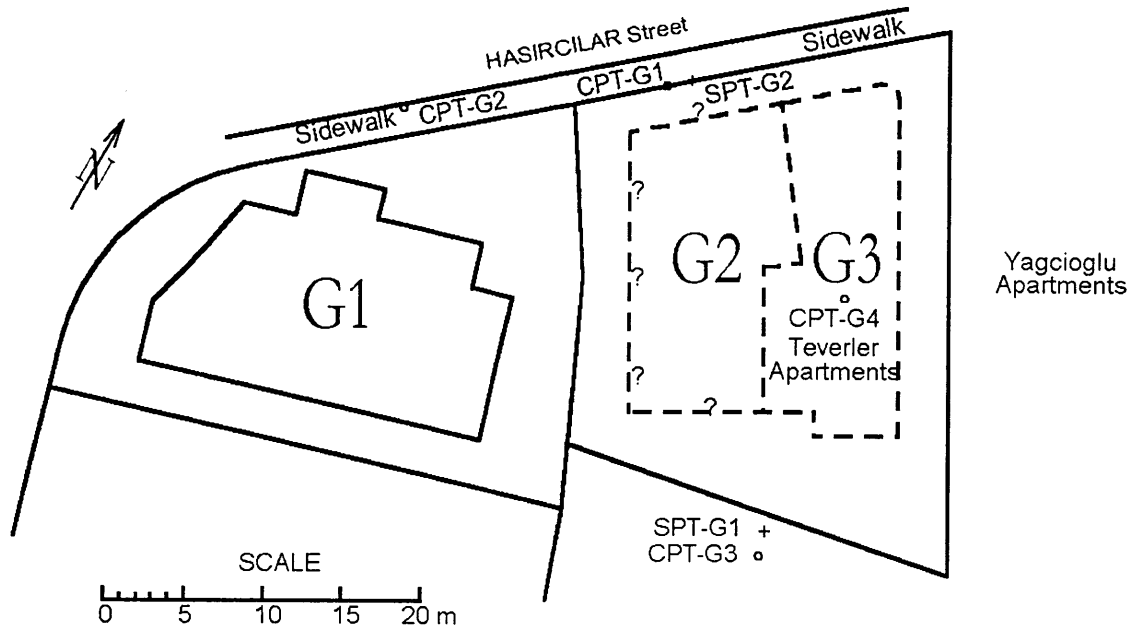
Plan view of Site G and location of subsurface exploration points
